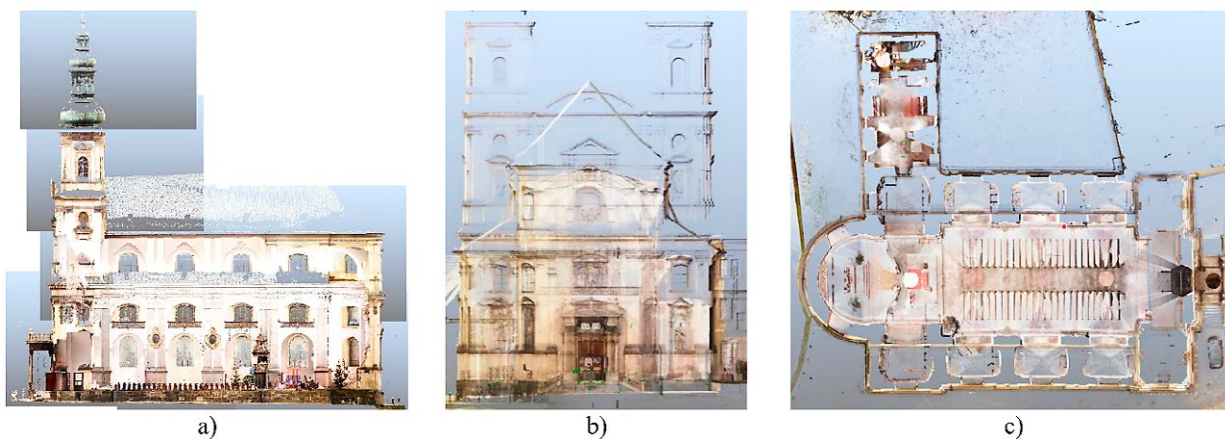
3D scans of the church: longitudinal section (a), cross-section (b), plan (c).
